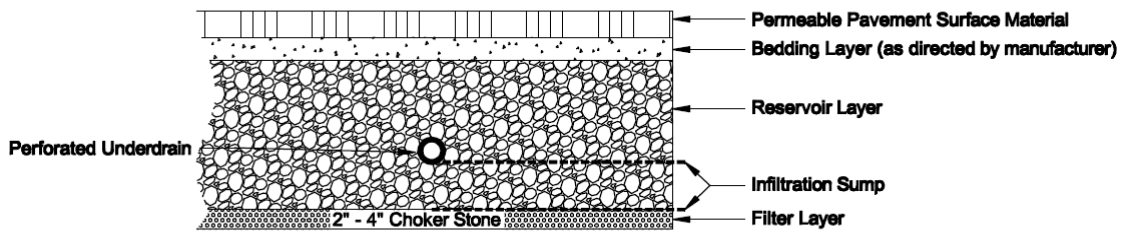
Cross Section of an Enhanced Permeable Pavement Design with an Underdrain.
